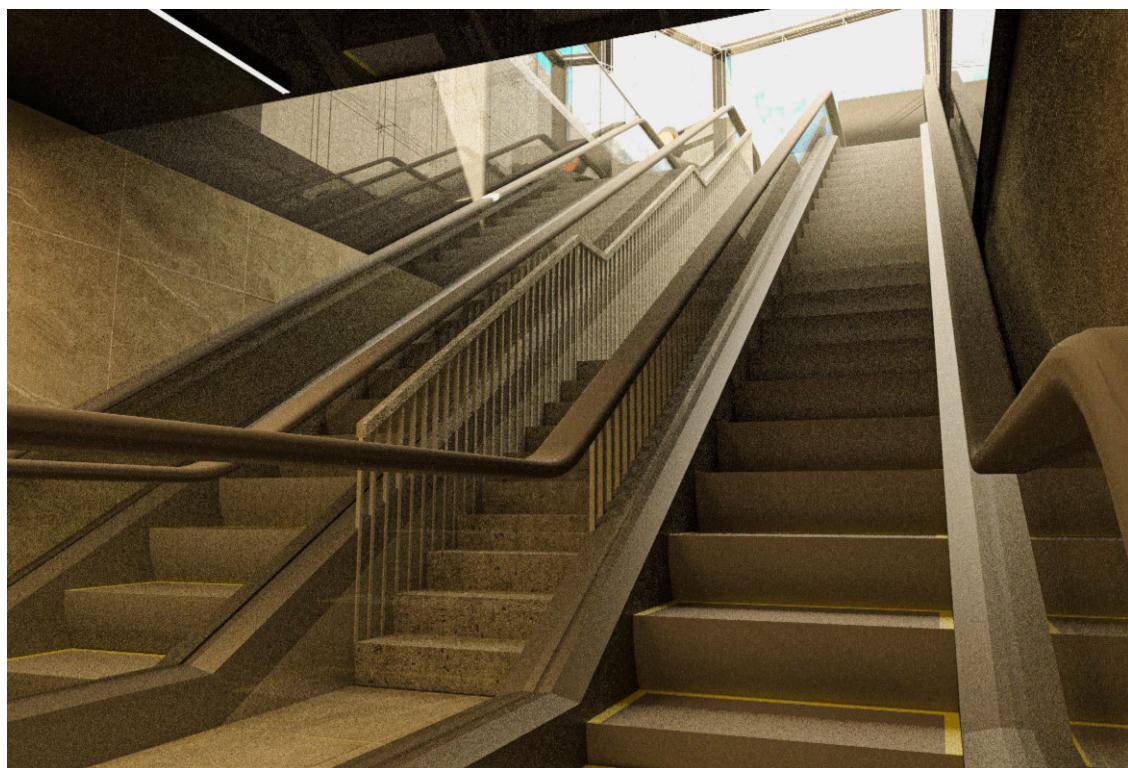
Magen David Metro Station, mezzanino level, exit B to Honigmann House.
